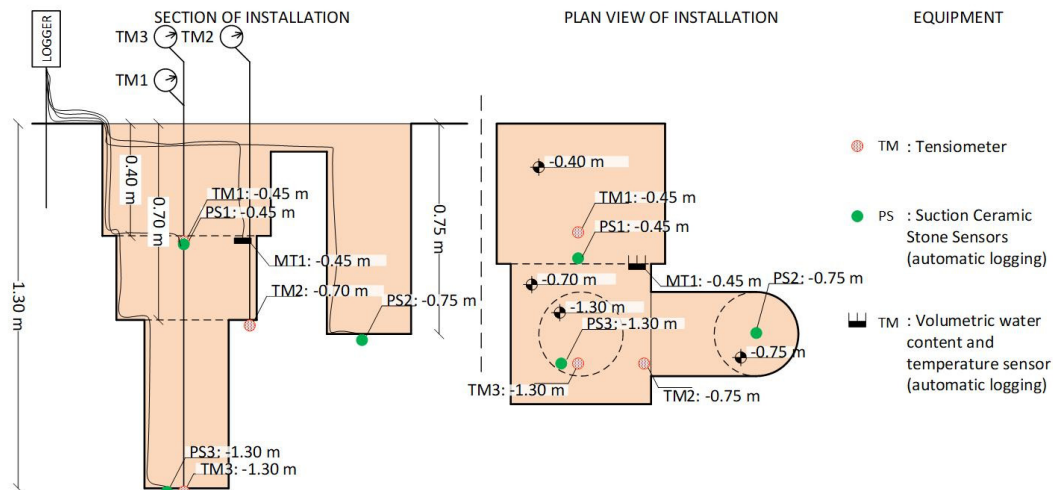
Soil profile of the station and sensor location in cross-section on the left and plan view on the right (schematic out of scale and proportion).
